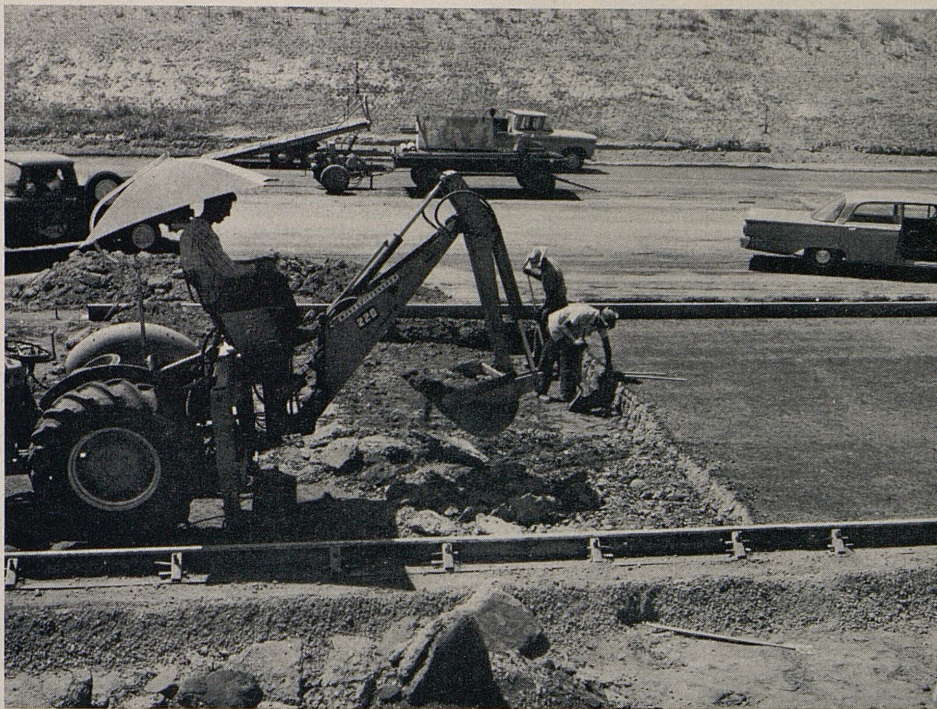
End anchors, which were thick concrete blocks, were constructed on the ends of the expanding cement units. The anchors prevented movement of the ends of the pavement, causing a buildup of compressive stress in the pavement during the curing period.
